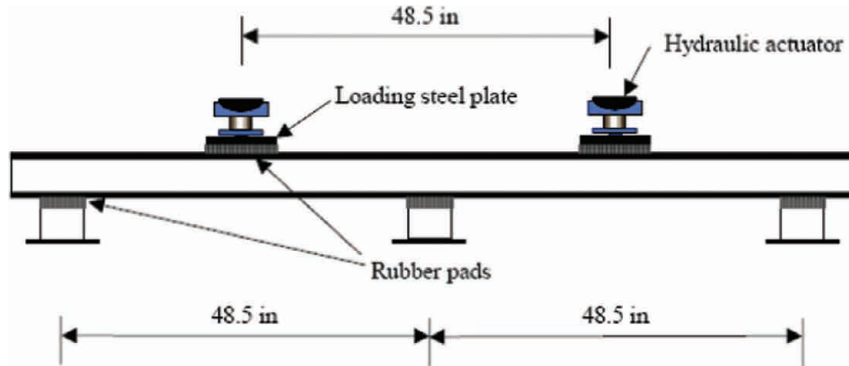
Loading for O'Fallon Park Bridge (Camata and Shing, 2004)
